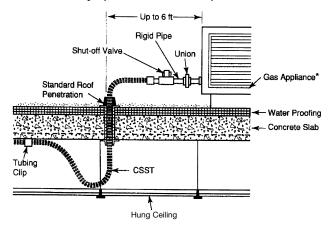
Short (1-6 foot) outdoor connection to roof mounted equipment
